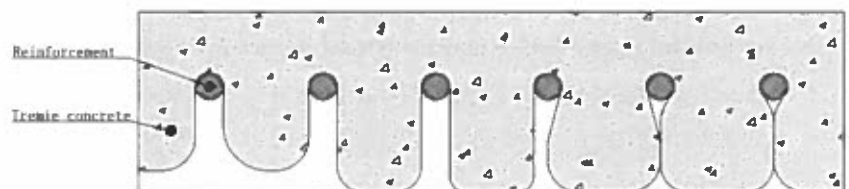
Section plot of the vertical mattressing (section width: 0.5 m)
